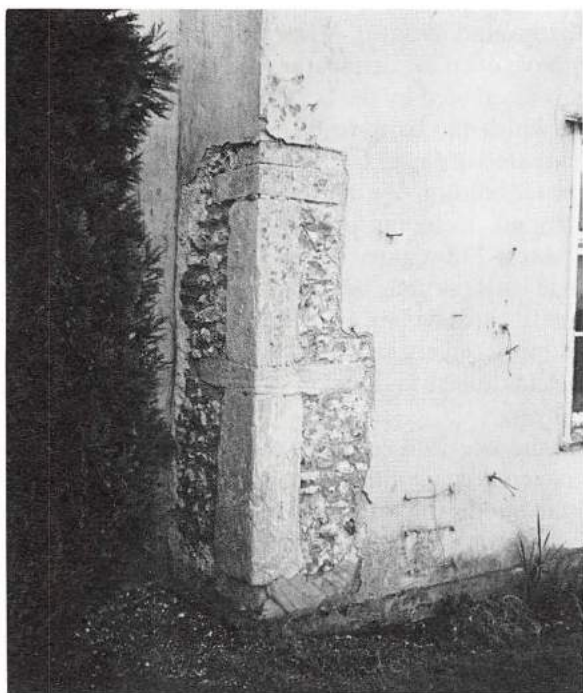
Plate I Long-and-short quoins at the north-east corner of Prior's Hall, Widdington (Photo: Dave Stenning).
